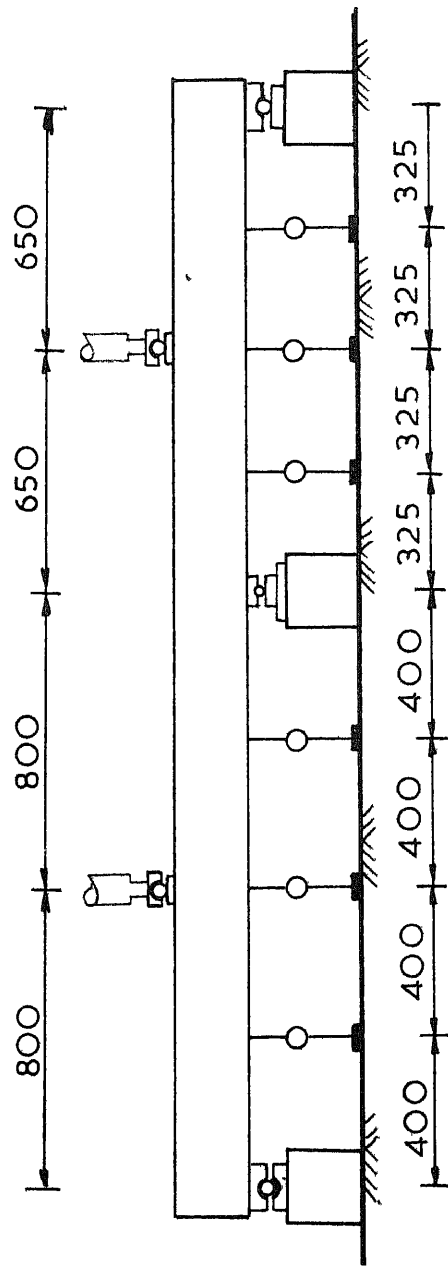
TWO SPAN CONTINUOUS BEAM (TEST SETUP)
